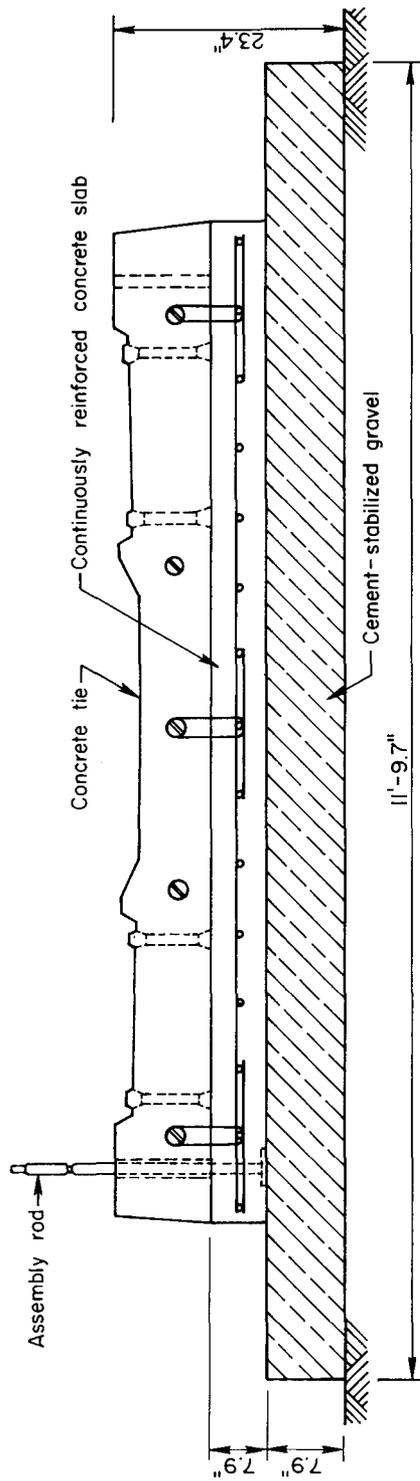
CROSS SECTION OF TRACK WITH CONCRETE TIES EMBEDDED IN SLAB
